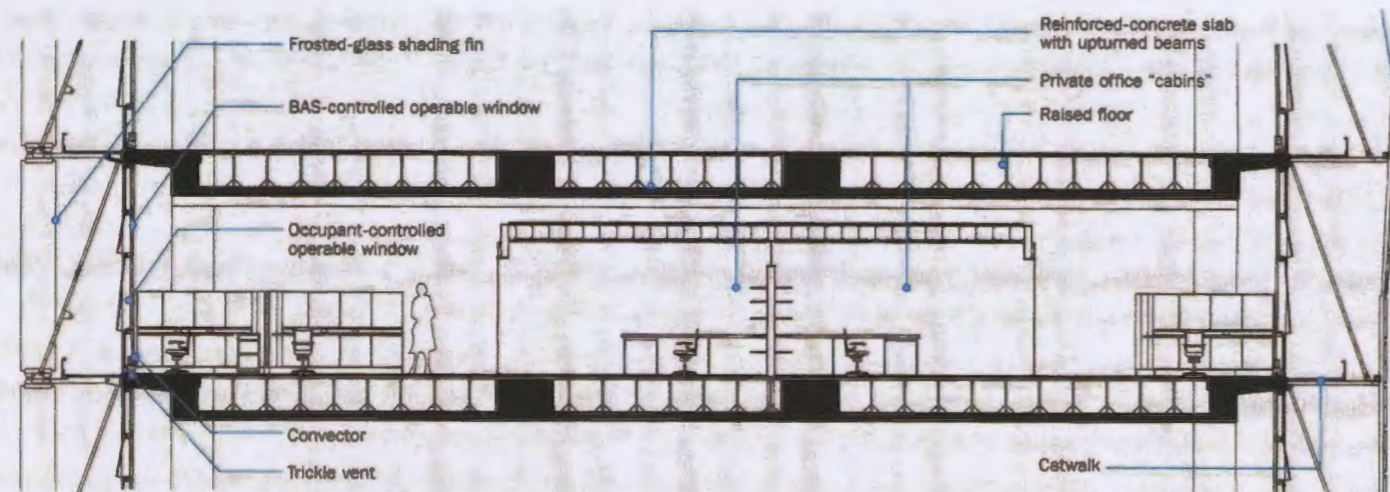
Cross-section of Federal building showing the facades on either side and the raised floor
